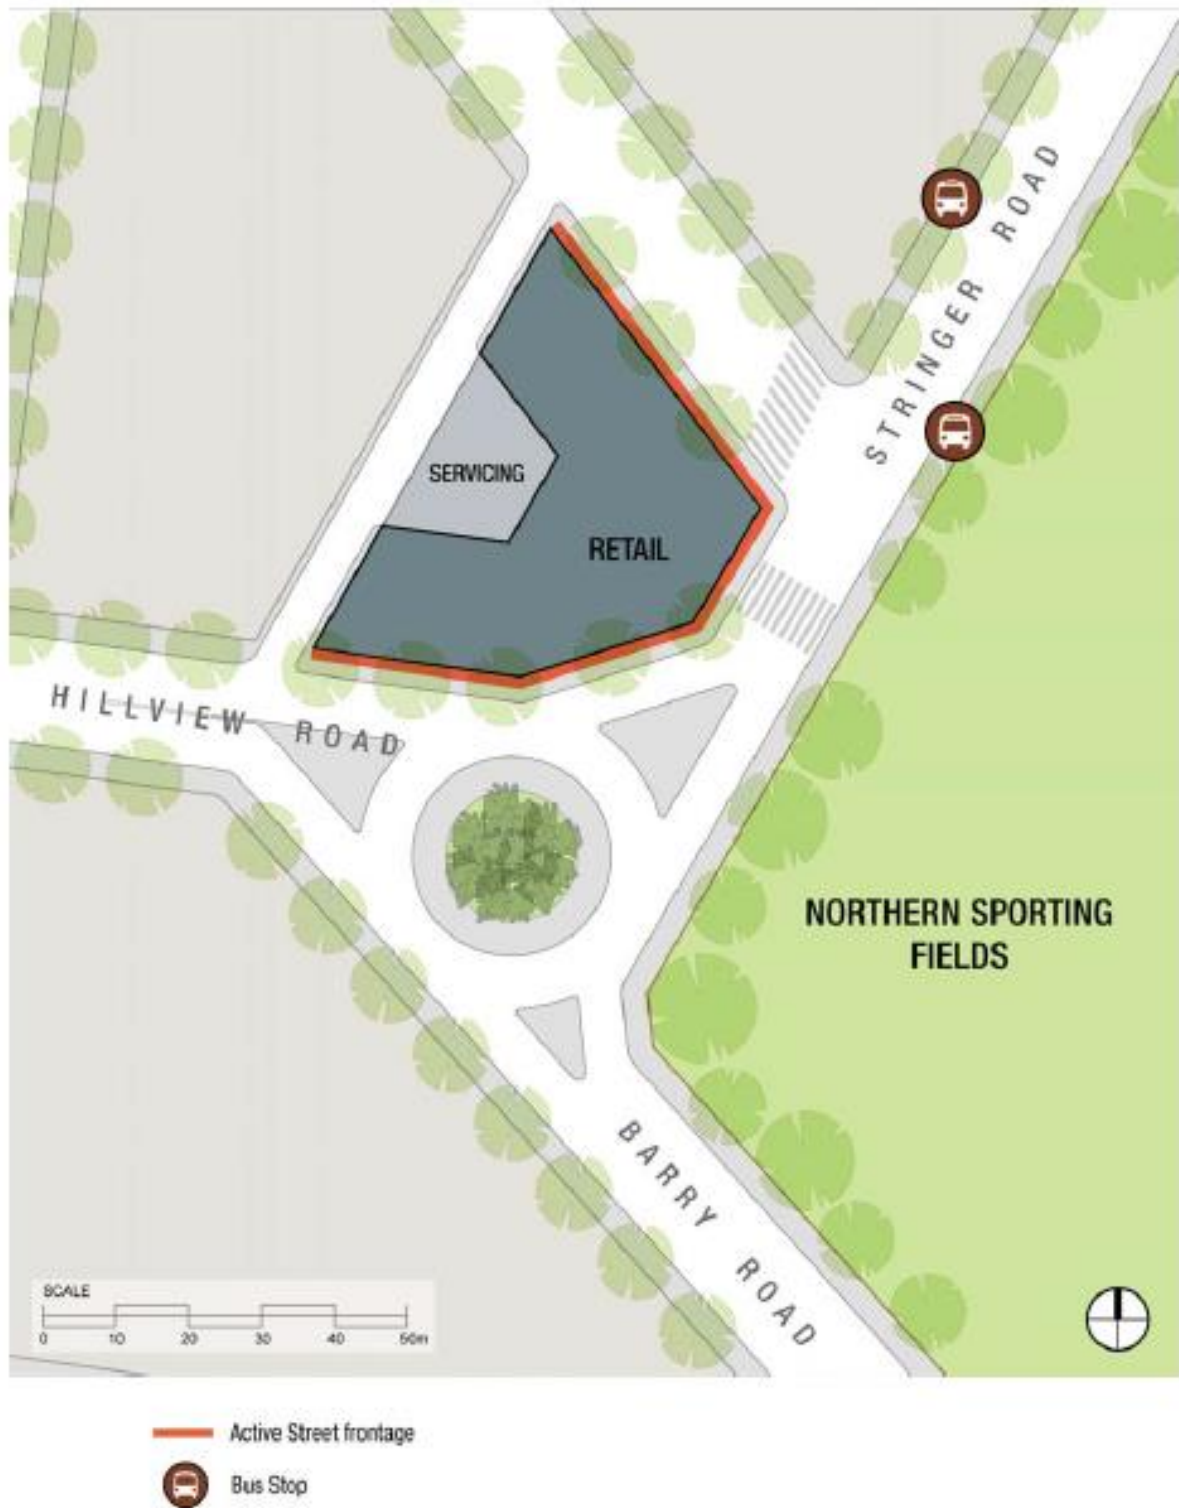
Indicative Layout Plan of Stringer Road Neighbourhood Centre
